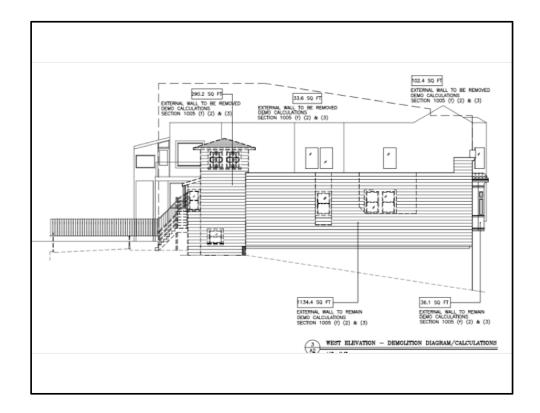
Drawing of existing west elevation illustrating the demolition of the gabled rooftop element, a character-defining feature, which is visible, in part, from Lombard Street.
